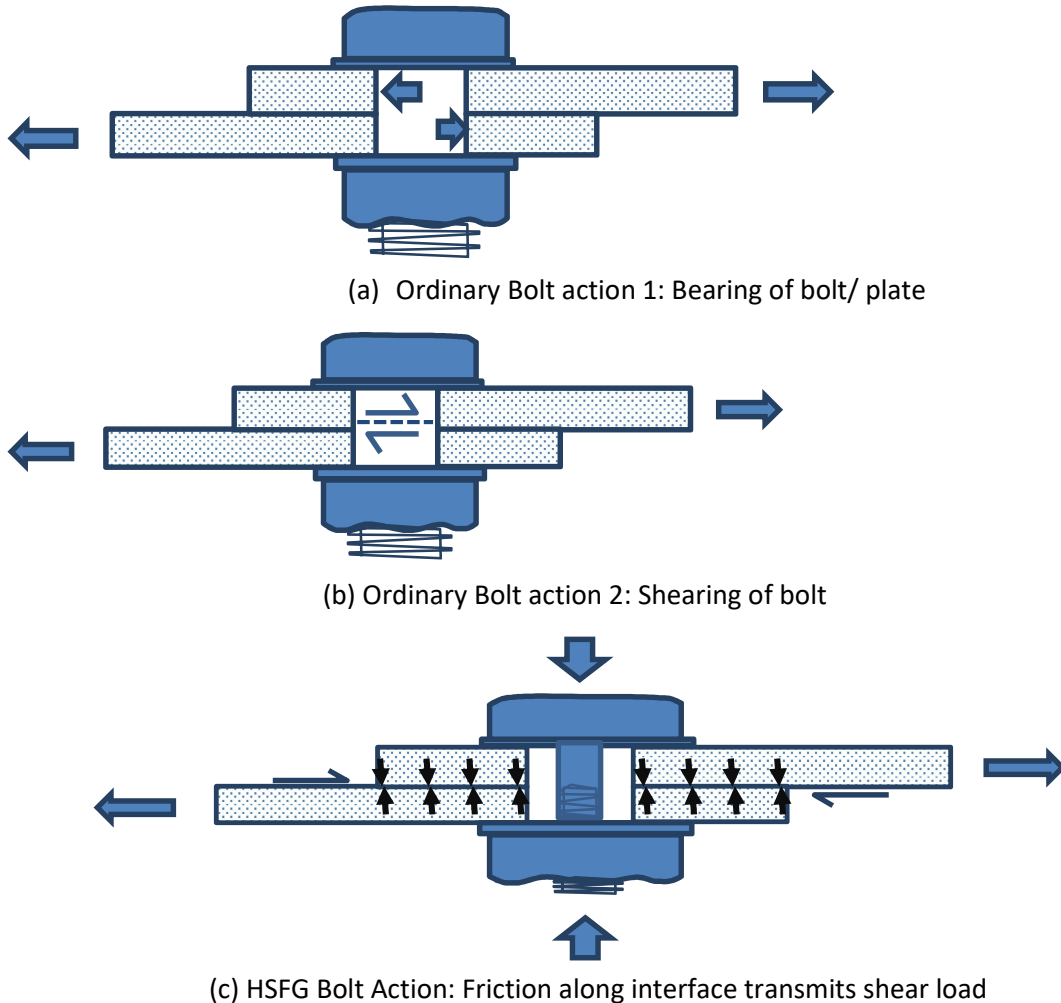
Comparison of mechanism of ordinary bolting assembly vis-à-vis HSFG bolting assembly
